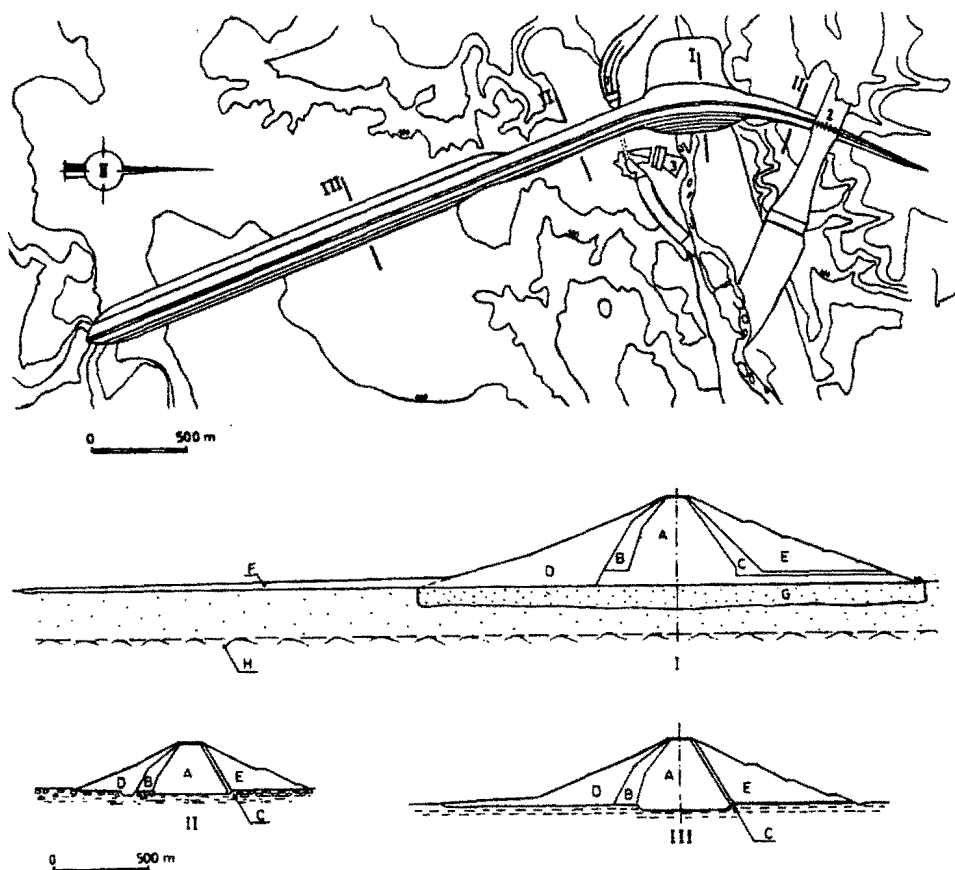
Plan and typical cross sections of Massingir dam (Serafim & Carvalho, 1970).
